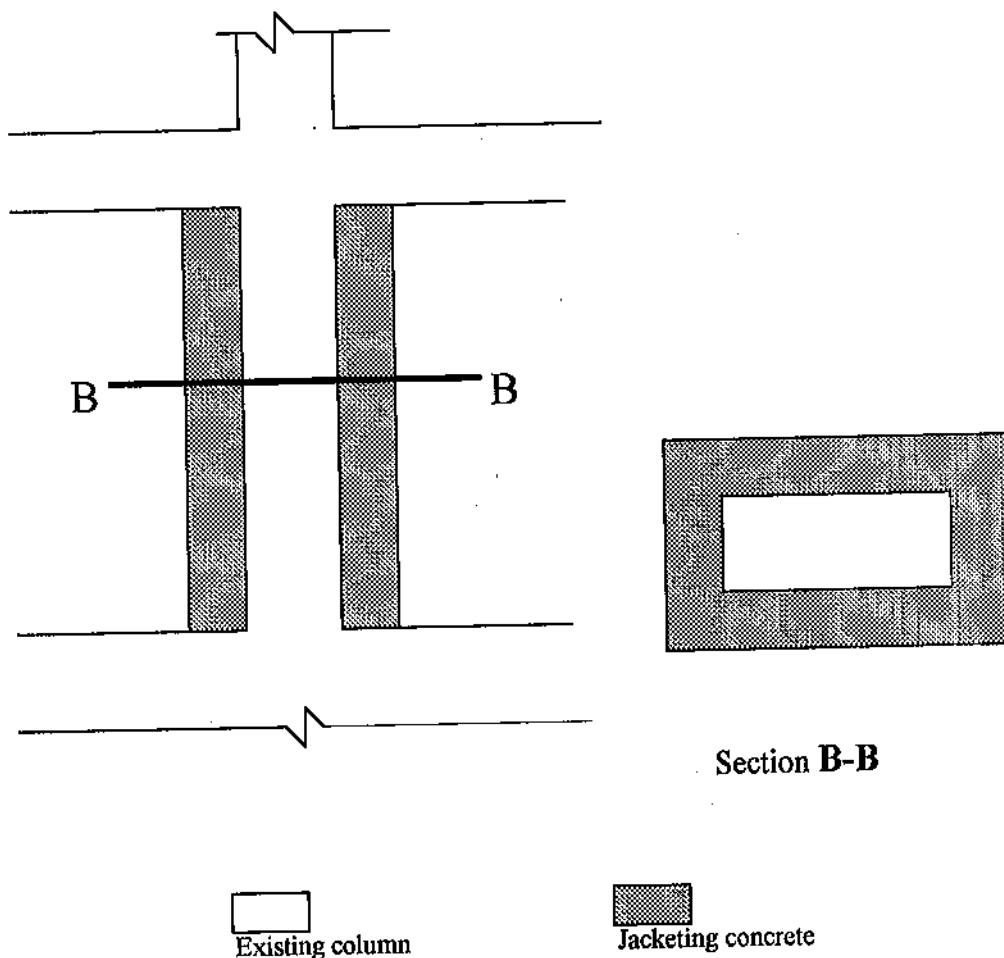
Jacketing existing reinforced concrete columns with reinforced concrete jacket.
